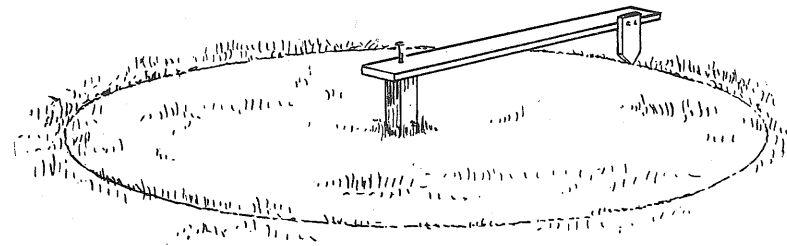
METHOD OF LAYING OUT FOUNDATION
